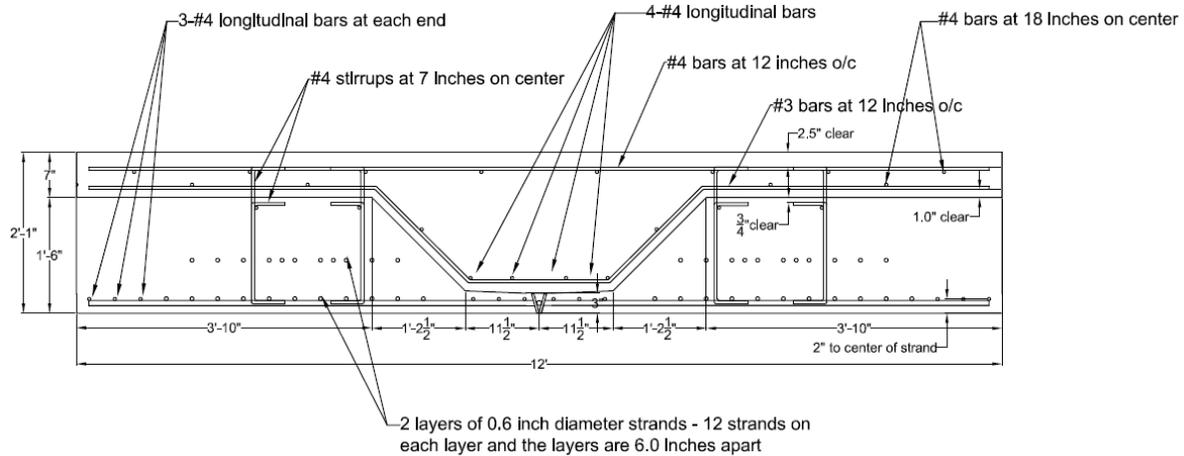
Reinforcing Details for Test Specimen #3 – Tapered web cross-sectional shape with embed plate connection
